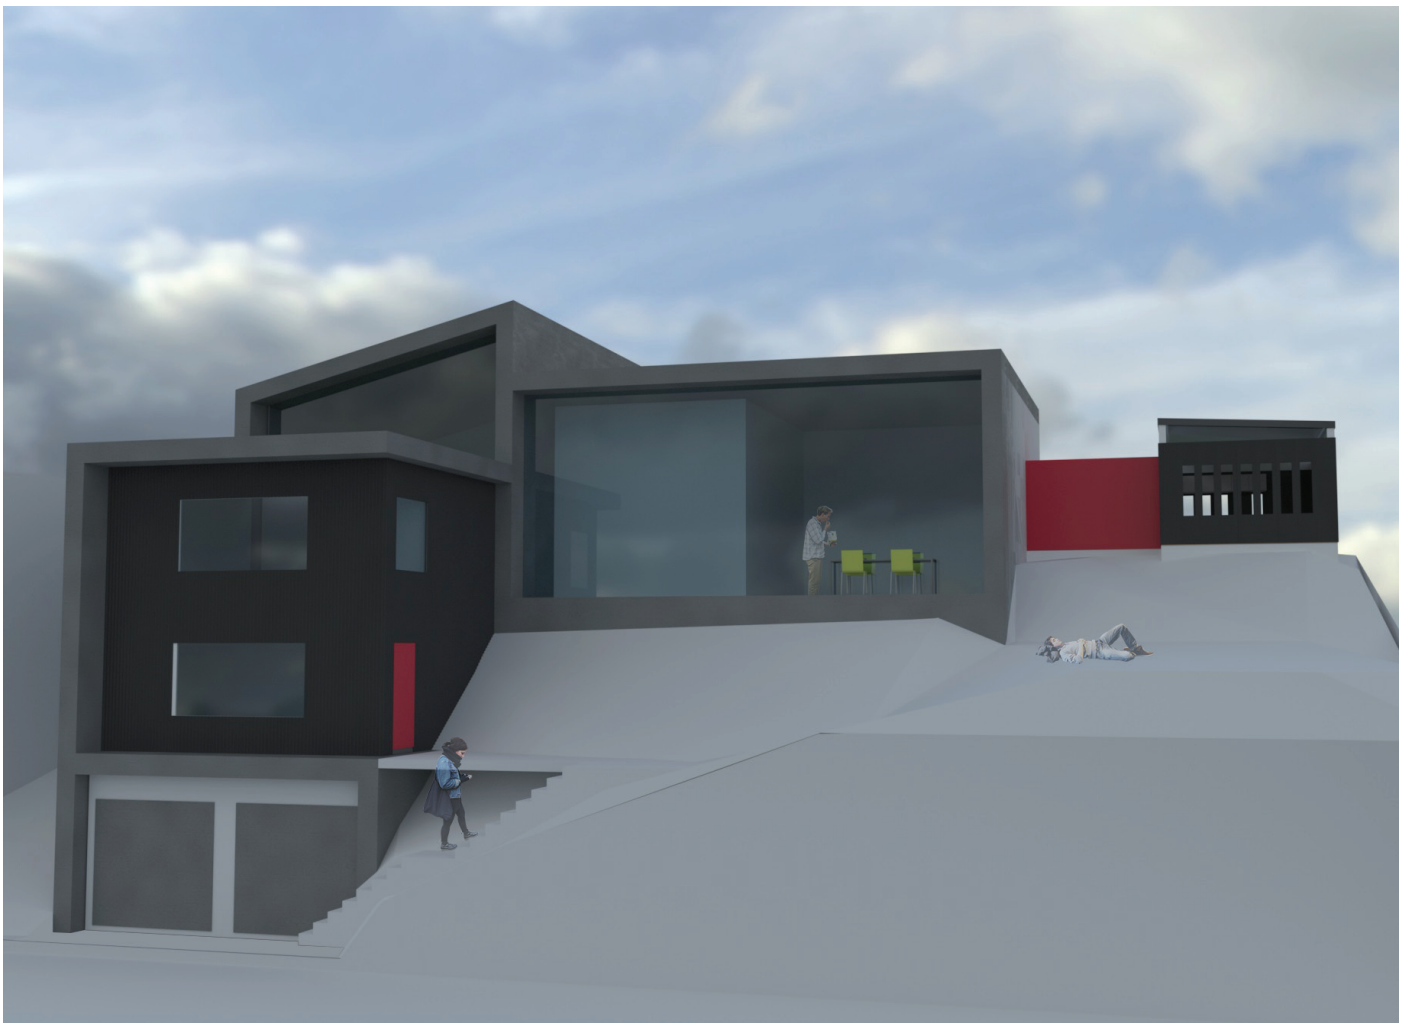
12 months post-disaster. The damaged house has been demolished. One initial module remains with adaptations and is attached via a linking module to a new module, which makes up 58 Wallace Street. 58B Wallace Street is a completely new build, and remains respectful of its heritage neighbours through its scale and proportions. The other initial modules are removed from site, to allow for outdoor space. These unnecessary modules will be relocated for reuse elsewhere.
